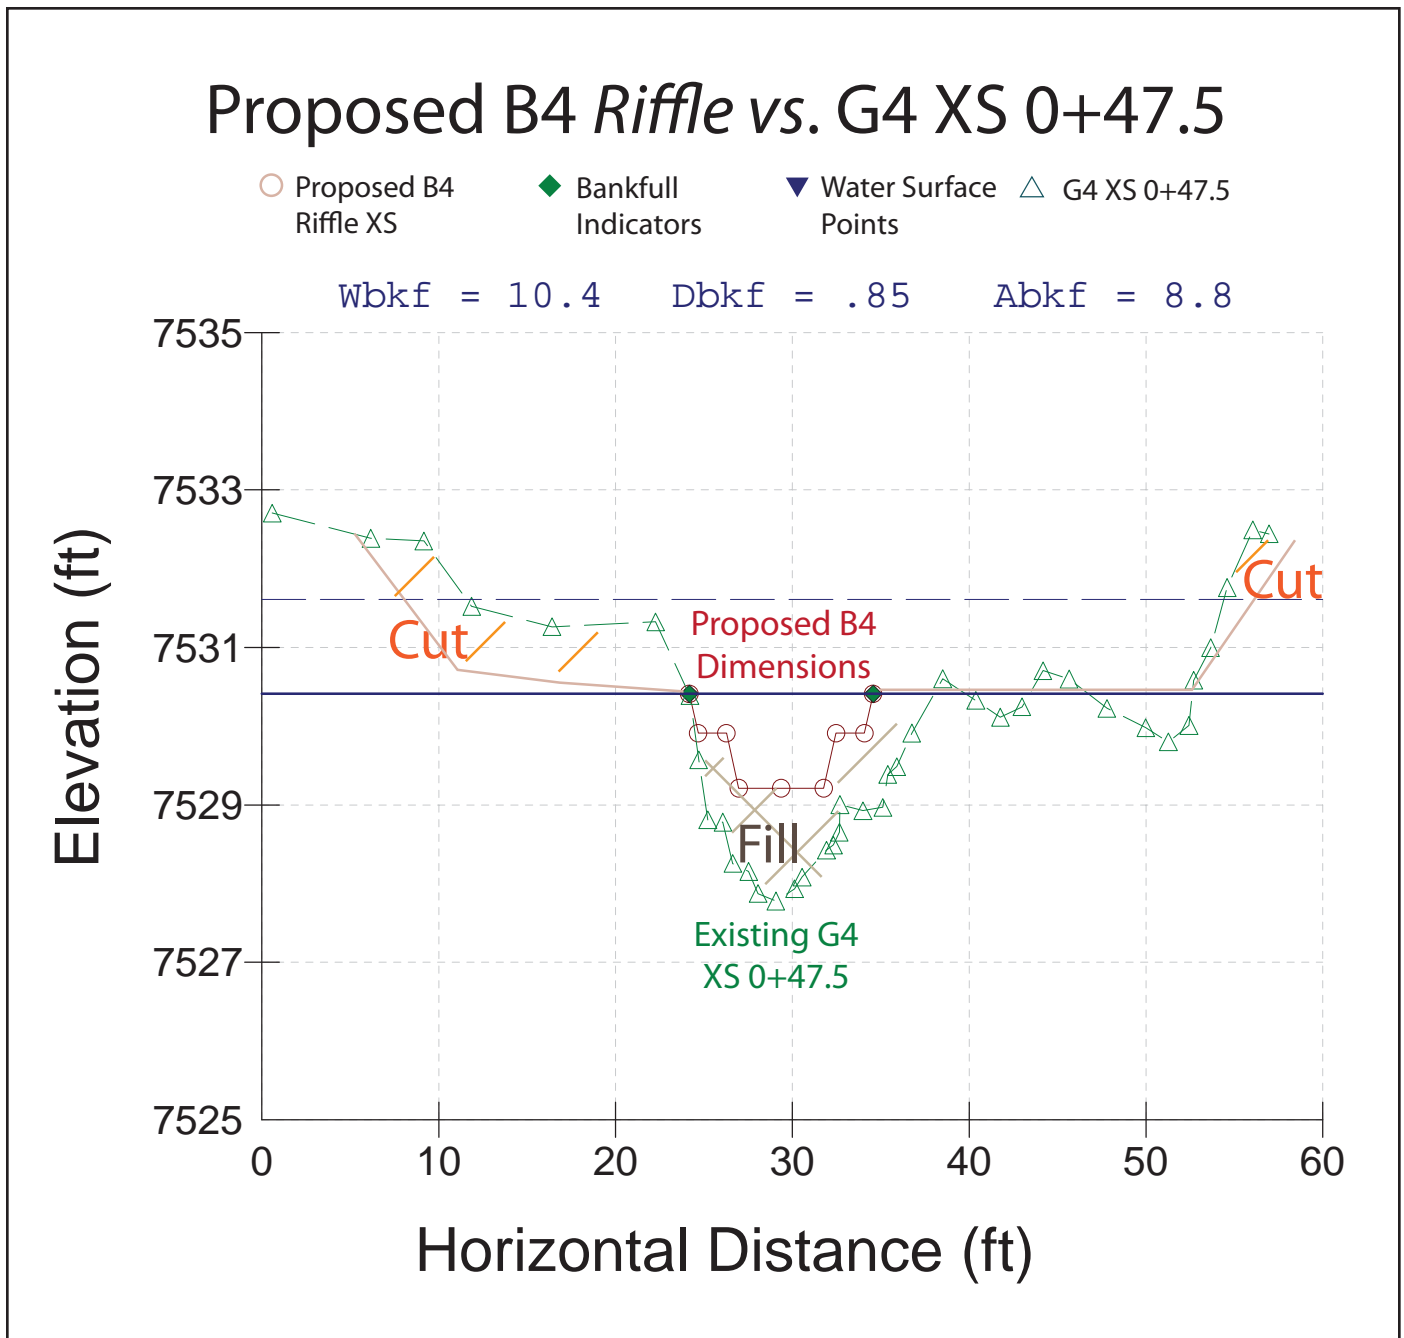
The proposed B4 *riffle* cross-section compared to the existing G4 cross-section 0+47.5, indicating the cut and fill requirements and new bankfull elevation.
